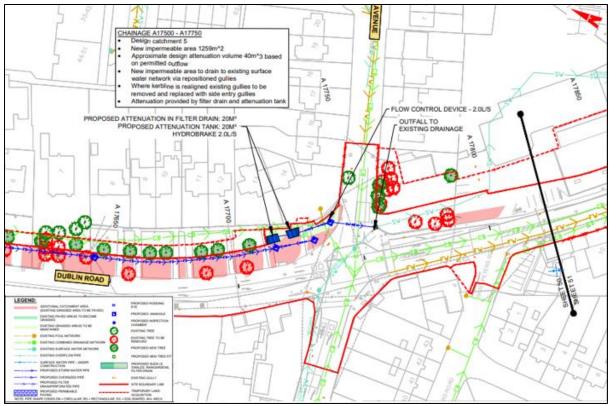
Extract from Proposed Surface Water Drainage Works Drawings (Sheet 50)
